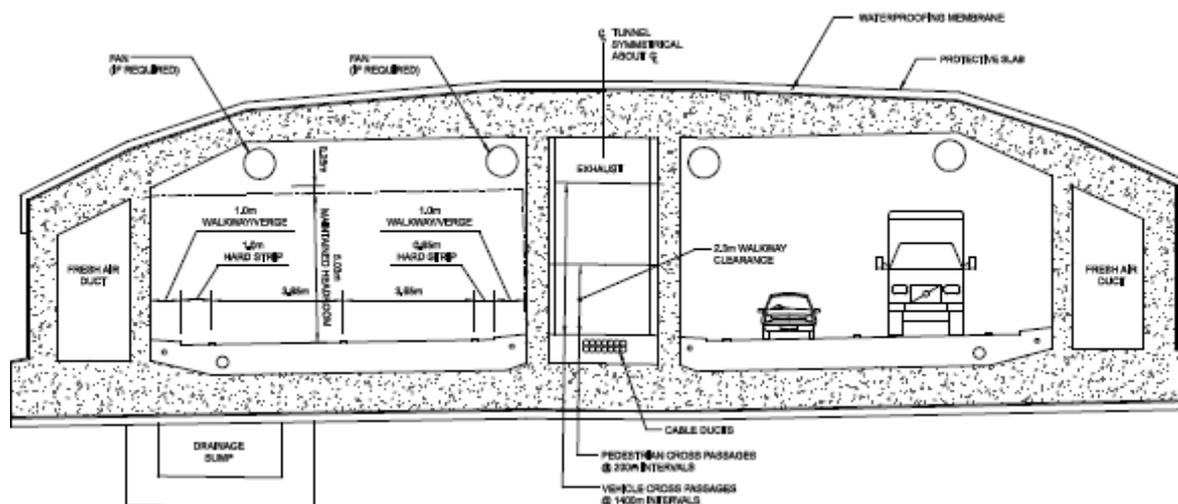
Typical Cross Section for an Immersed Tube Tunnel.
